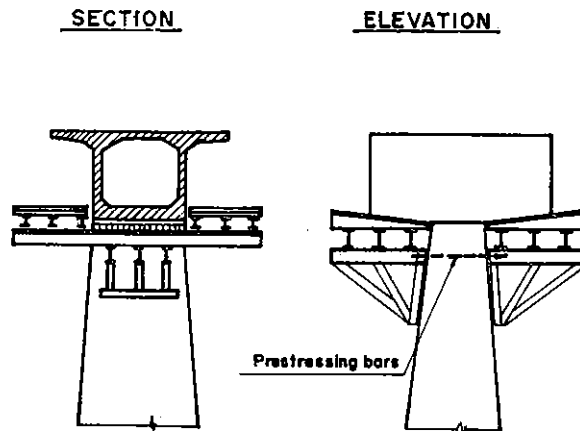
Construction of the pier-segment for a cast-in-situ cantilever deck
